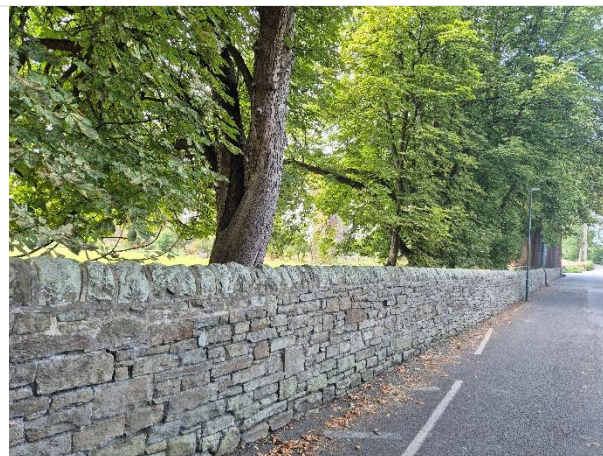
Stone wall along Ridding Lane at the northern site boundary
